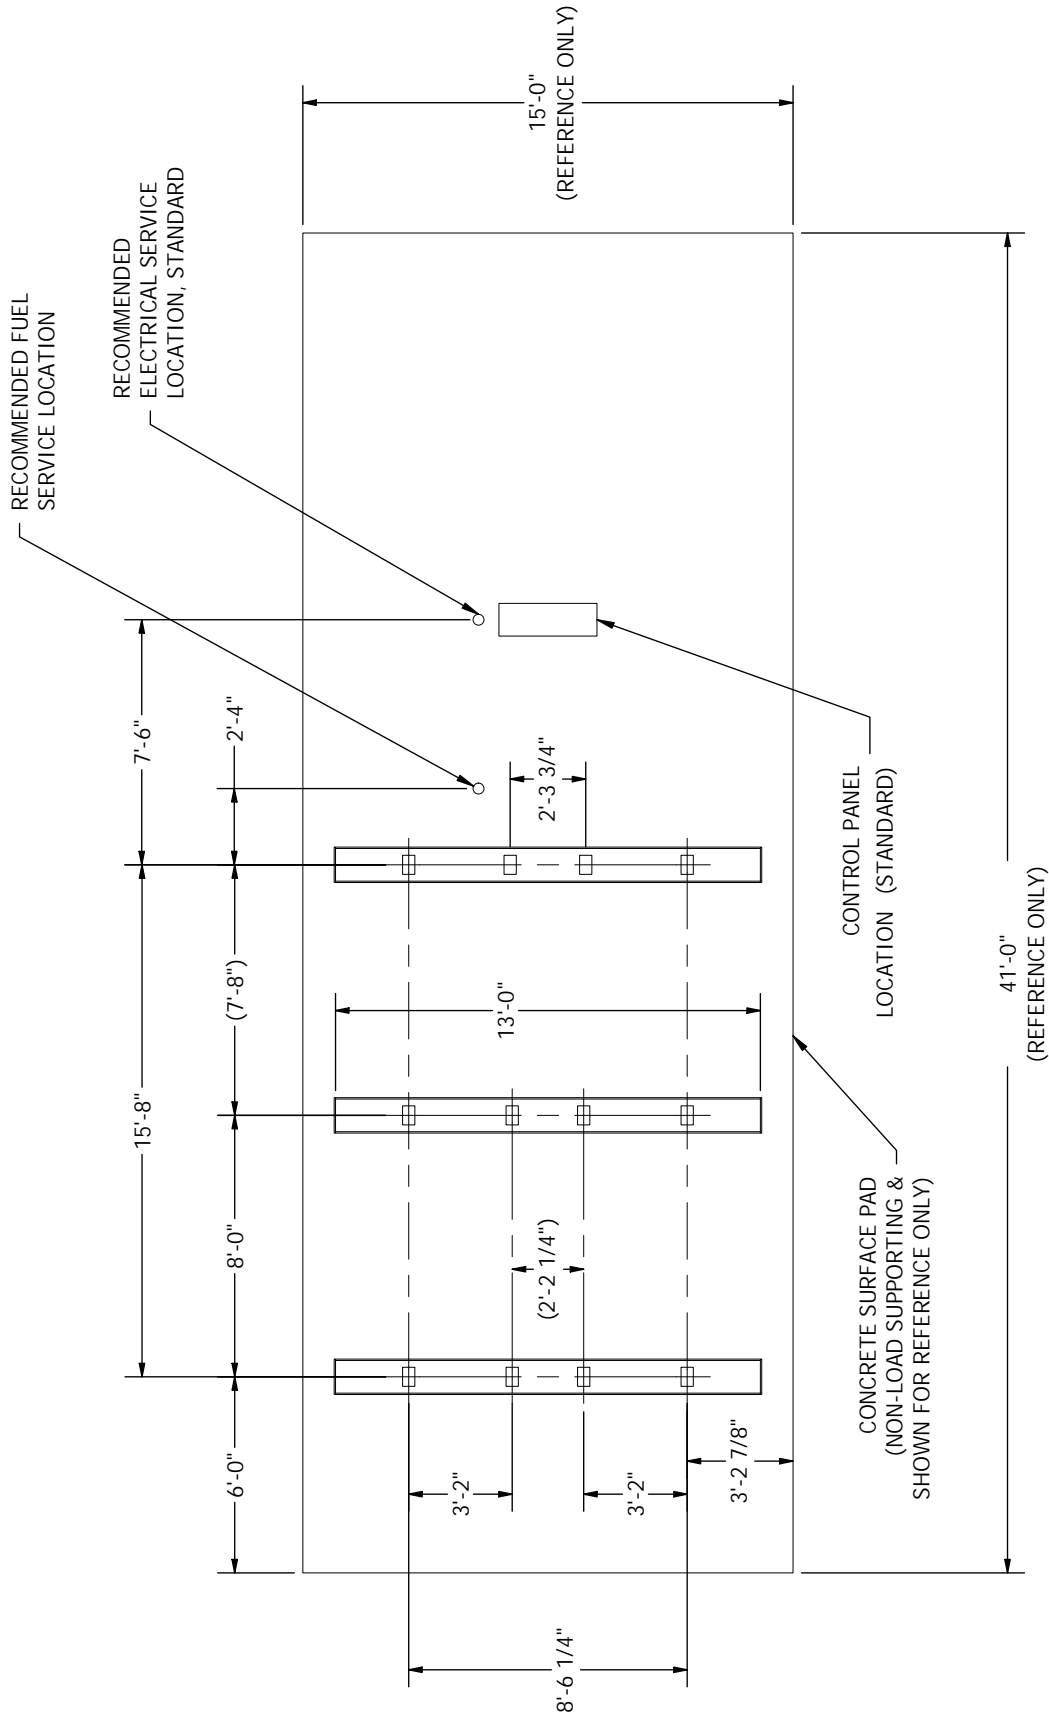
Load Point (Anchor Legs) Layout for Dryer Models D16106, D16120, and D16140
